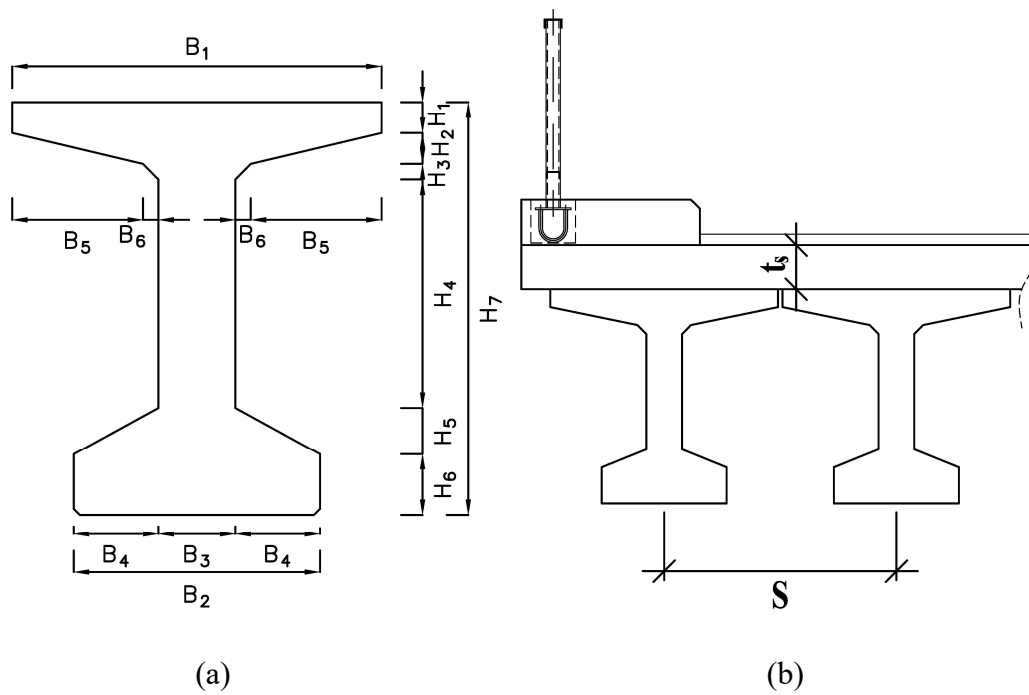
(a) Girder parametric dimensions (b) Girder spacing ( $S$ ) and slab thickness ( $t_s$ )
